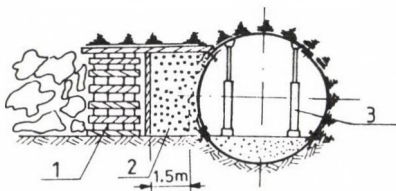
Development of side dams. 1 - buttress; 2 - side dam; 3 - roadway with circular arch support system strengthened by hydraulic props
